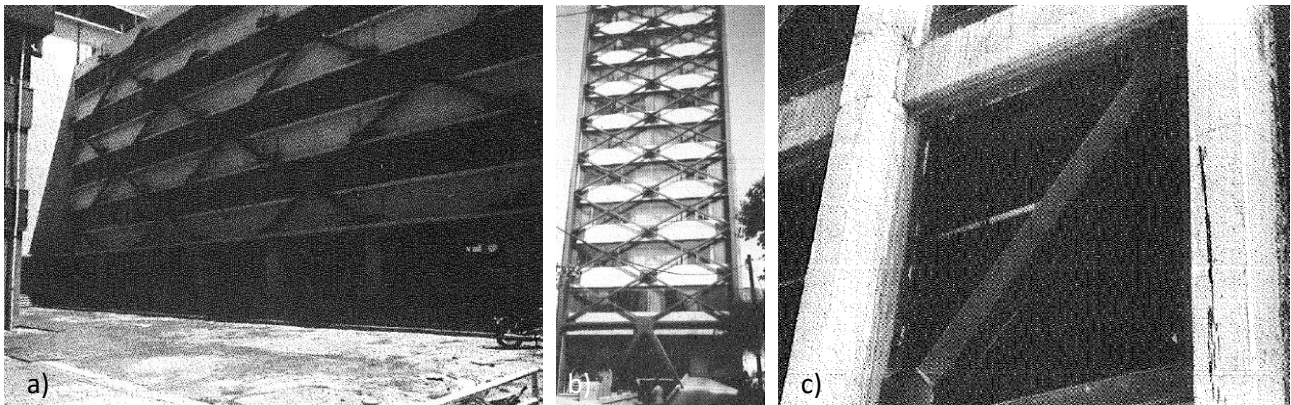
a) School building in Sendai, Japan; b) RC building in Mexico City braced prior to 1985 earthquake; c) undamaged hospital building in Mexico City braced following 1985 earthquake – Source: [107]
